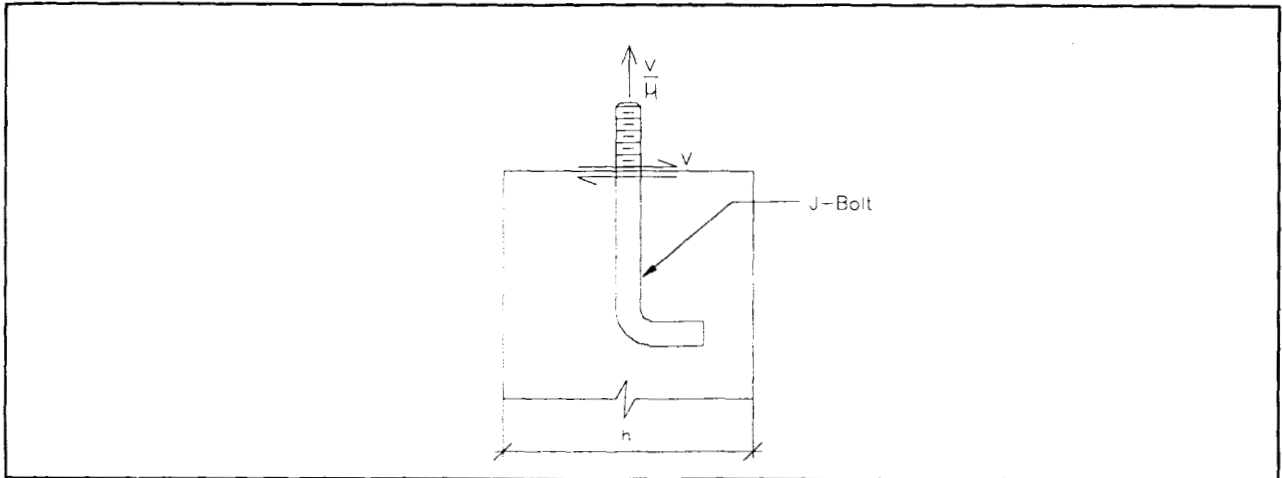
Forces on Bolt for Bolted Sill Plate Roof Connection
